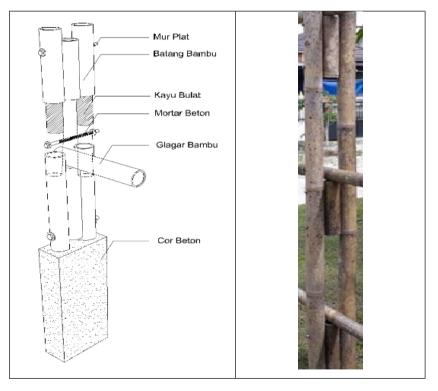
Detailed Images of Construction Applications for Supporting Columns of Simple and Healthy Sustainable Houses Made of Central Kalimantan's Local Bamboo.
